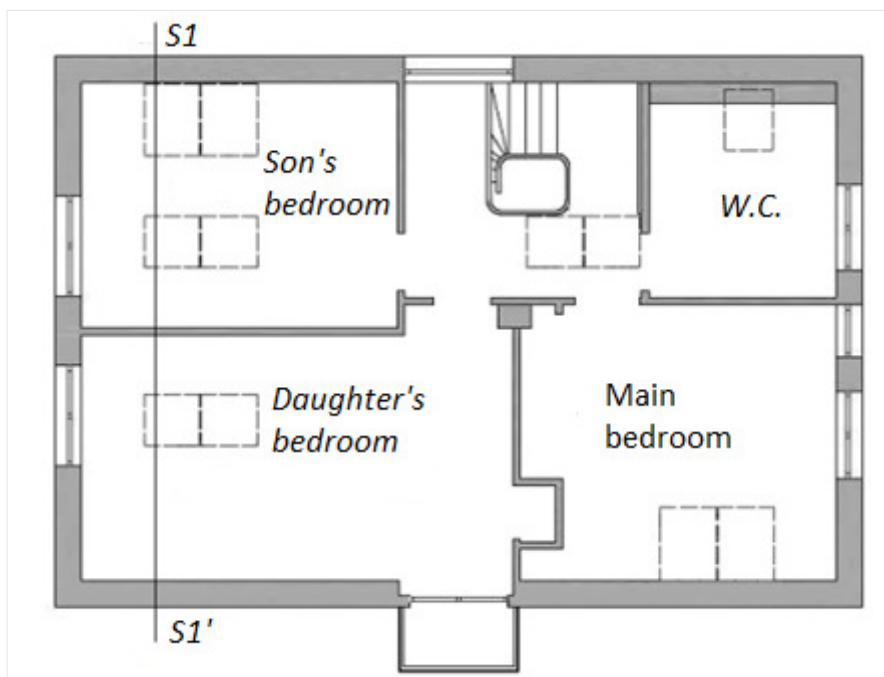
Architecture floor plan of the simulated upper floor (three bedrooms, W.C. stairs and corridor) of the examined case study (roof and façade windows are indicated).
